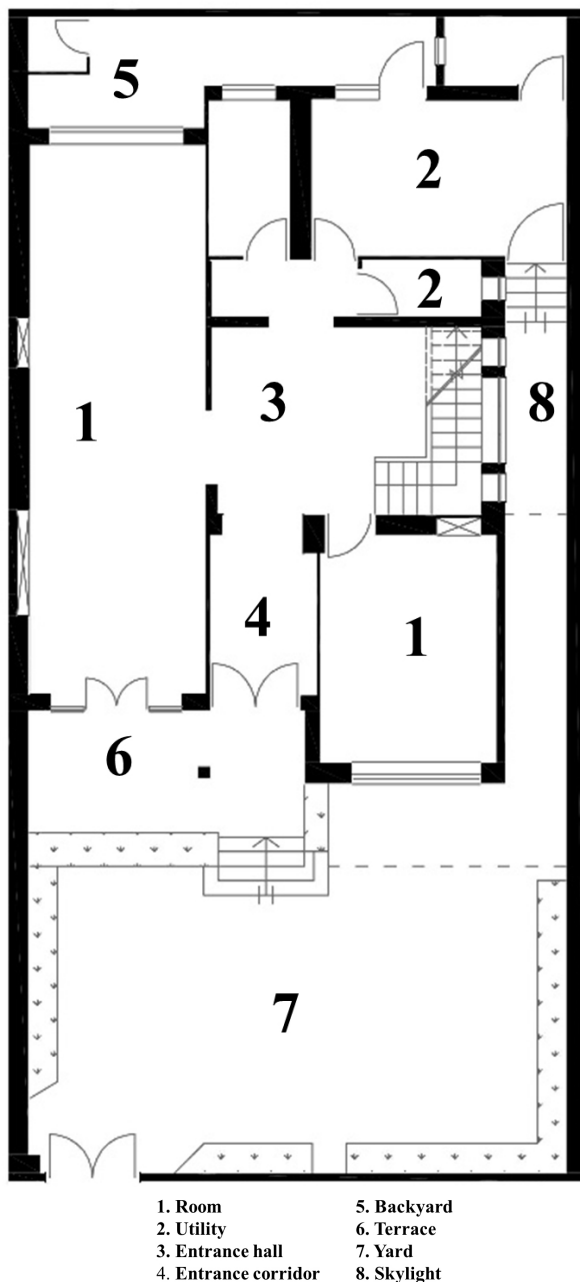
Ground floor plan (1/250) of the House No. 7. Source: Authors.
